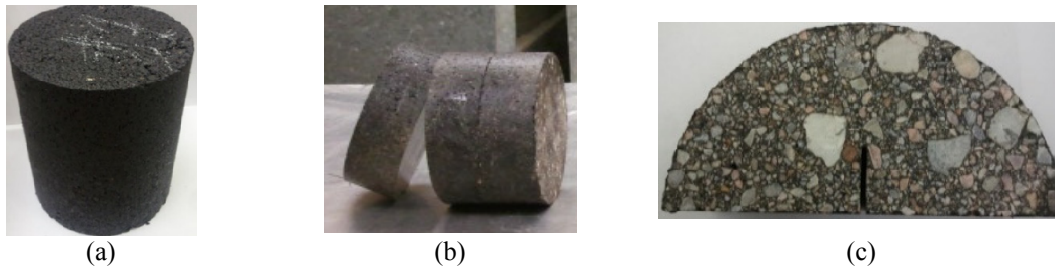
SCB specimen fabrication process: (a) compacting, (b) slicing, and (c) notching.
